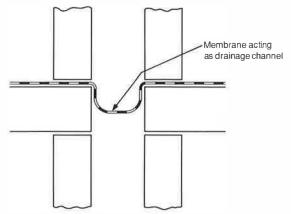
Radon-proof barrier continued across party wall and acting as drainage channel
